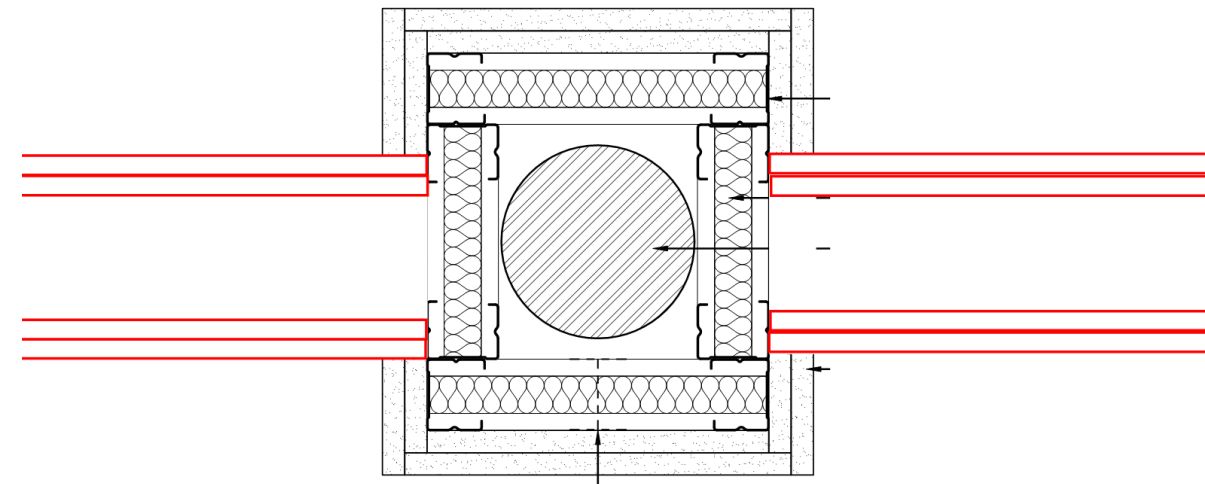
Detailing sketch of junction between party wall partition and encased retained columns
